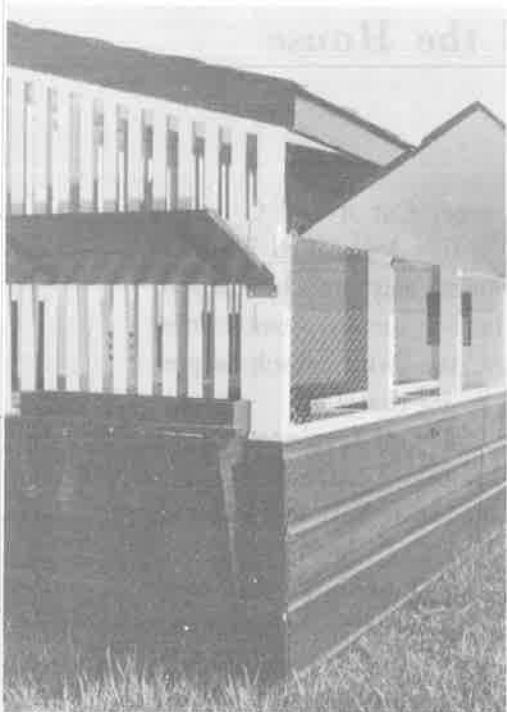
Exterior of the poultry house with solid siding, lathing, and poultry netting. The back panel and water trough shield are hinged.
